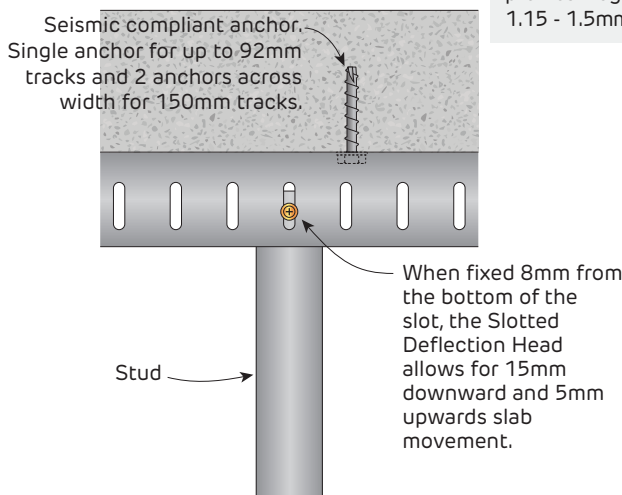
Wall Head Slotted Deflection Head Track Elevation
